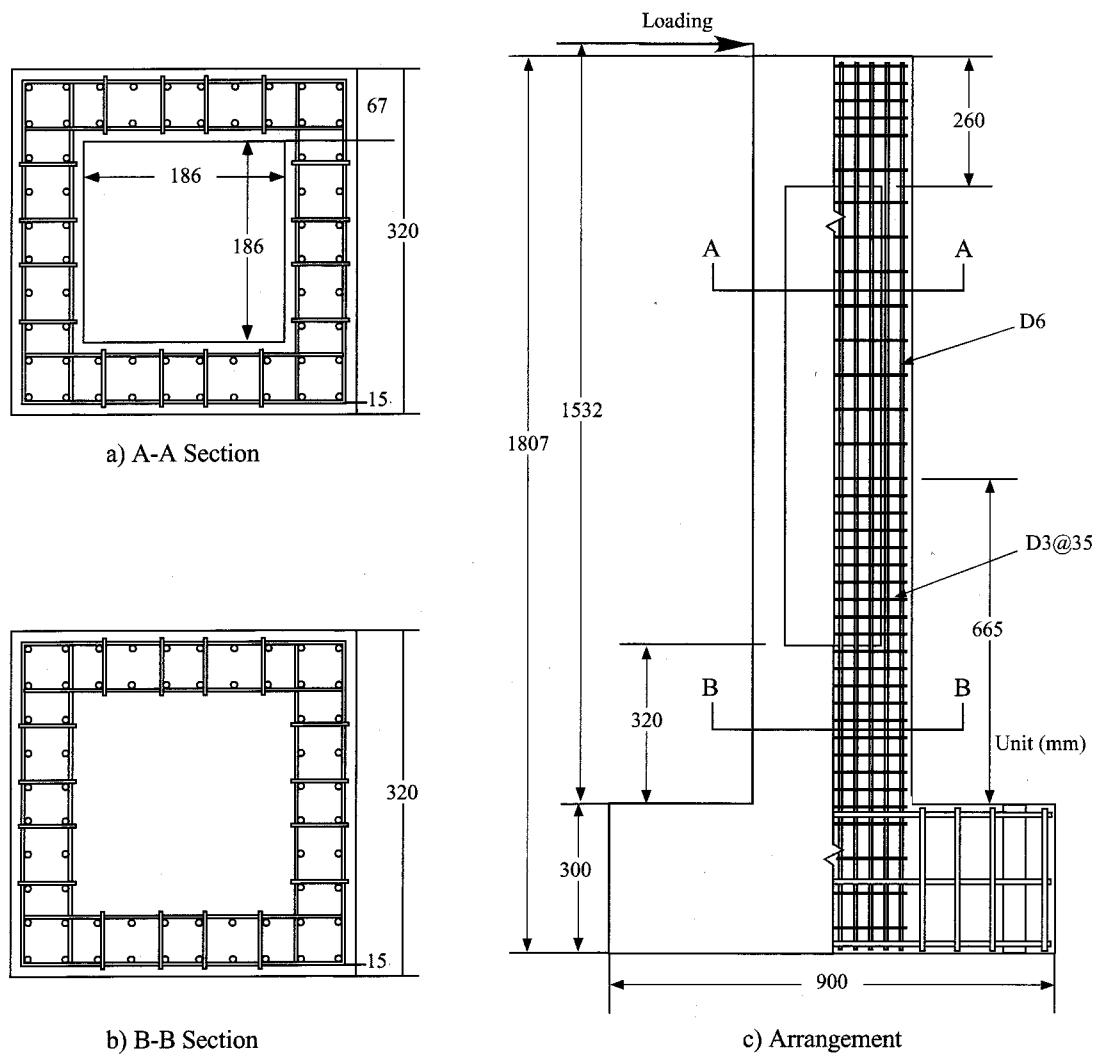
Arrangement of RC Specimen with Hollow Section
